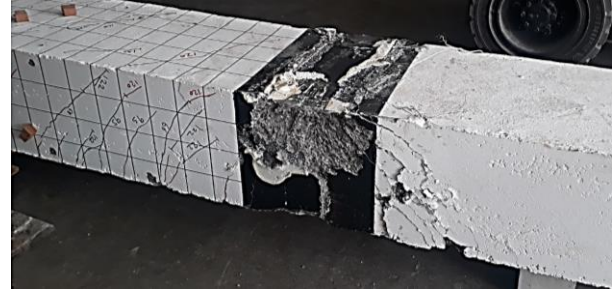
Failure zones in B-20 (left) and B-23 (right)
